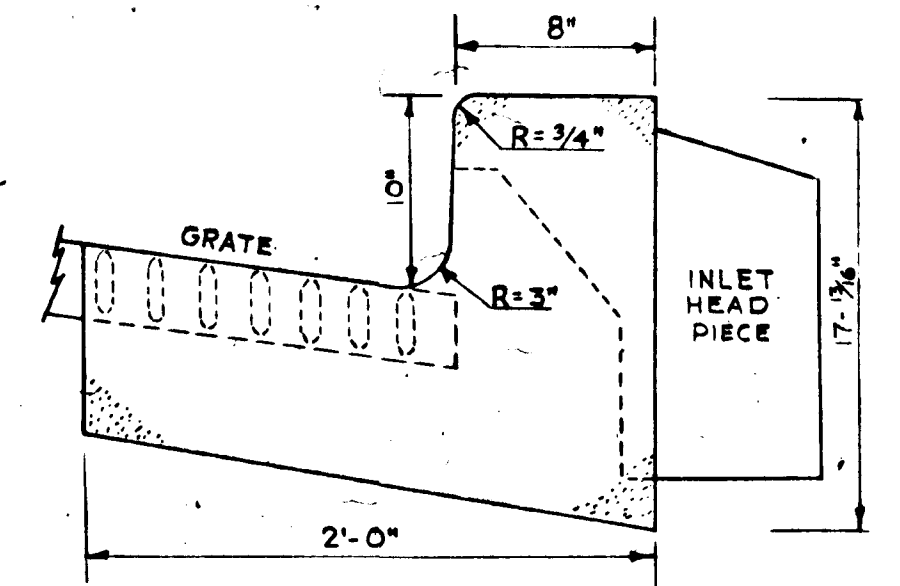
DETAIL OF MOUNTABLE CURB TRANSITION TO INLET CURB PIECE
